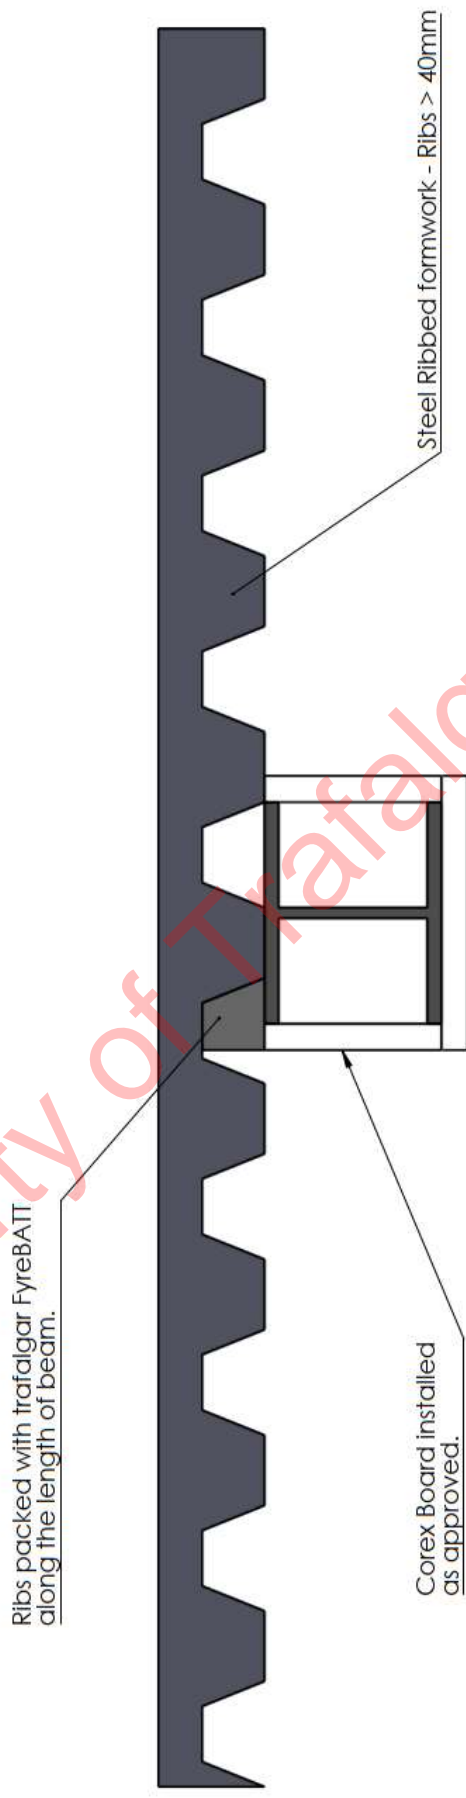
The construction detail of protected beam parallel to the voids of a composite floor slab with ribs (> 40 mm) packed with Trafalgar FyreBATT along the length of the beam
